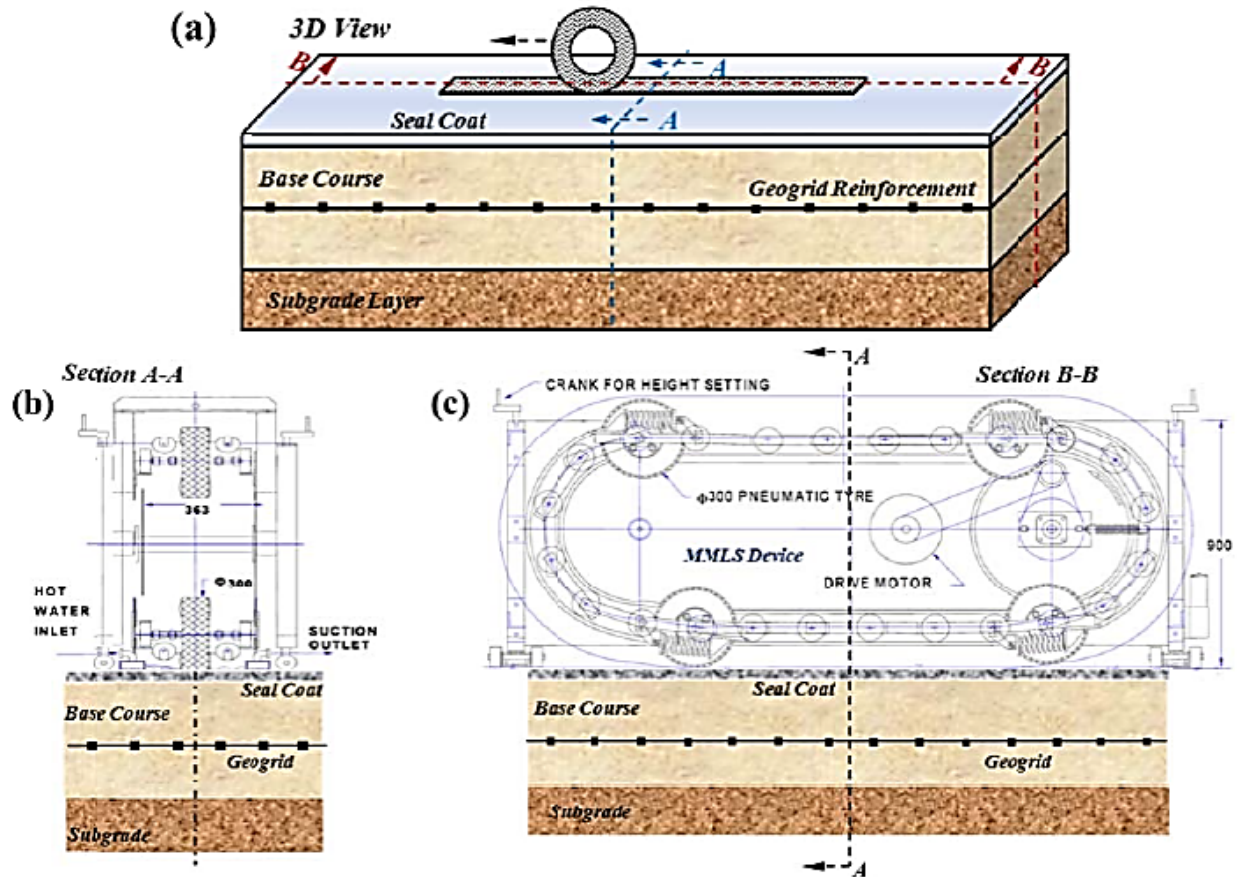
Pavement in APT program: (a) Schematic View (b) Cross-section (c) Longitudinal Section.
